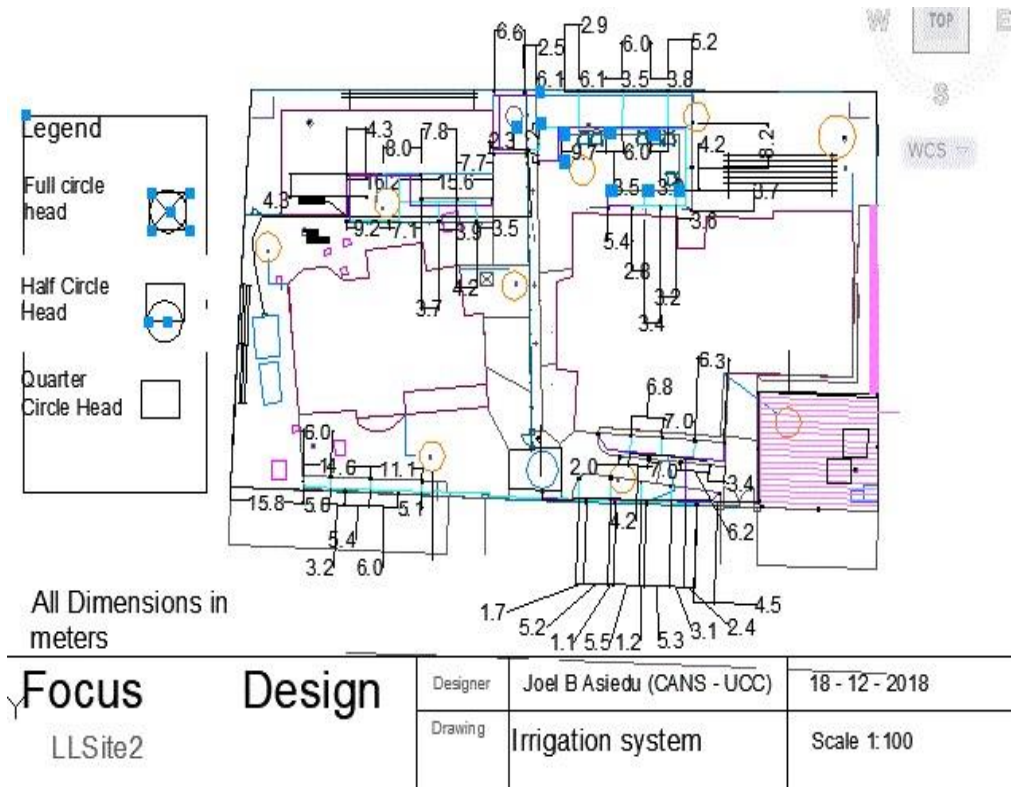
15: LLSite2 Plan - Detailing for Irrigation System
